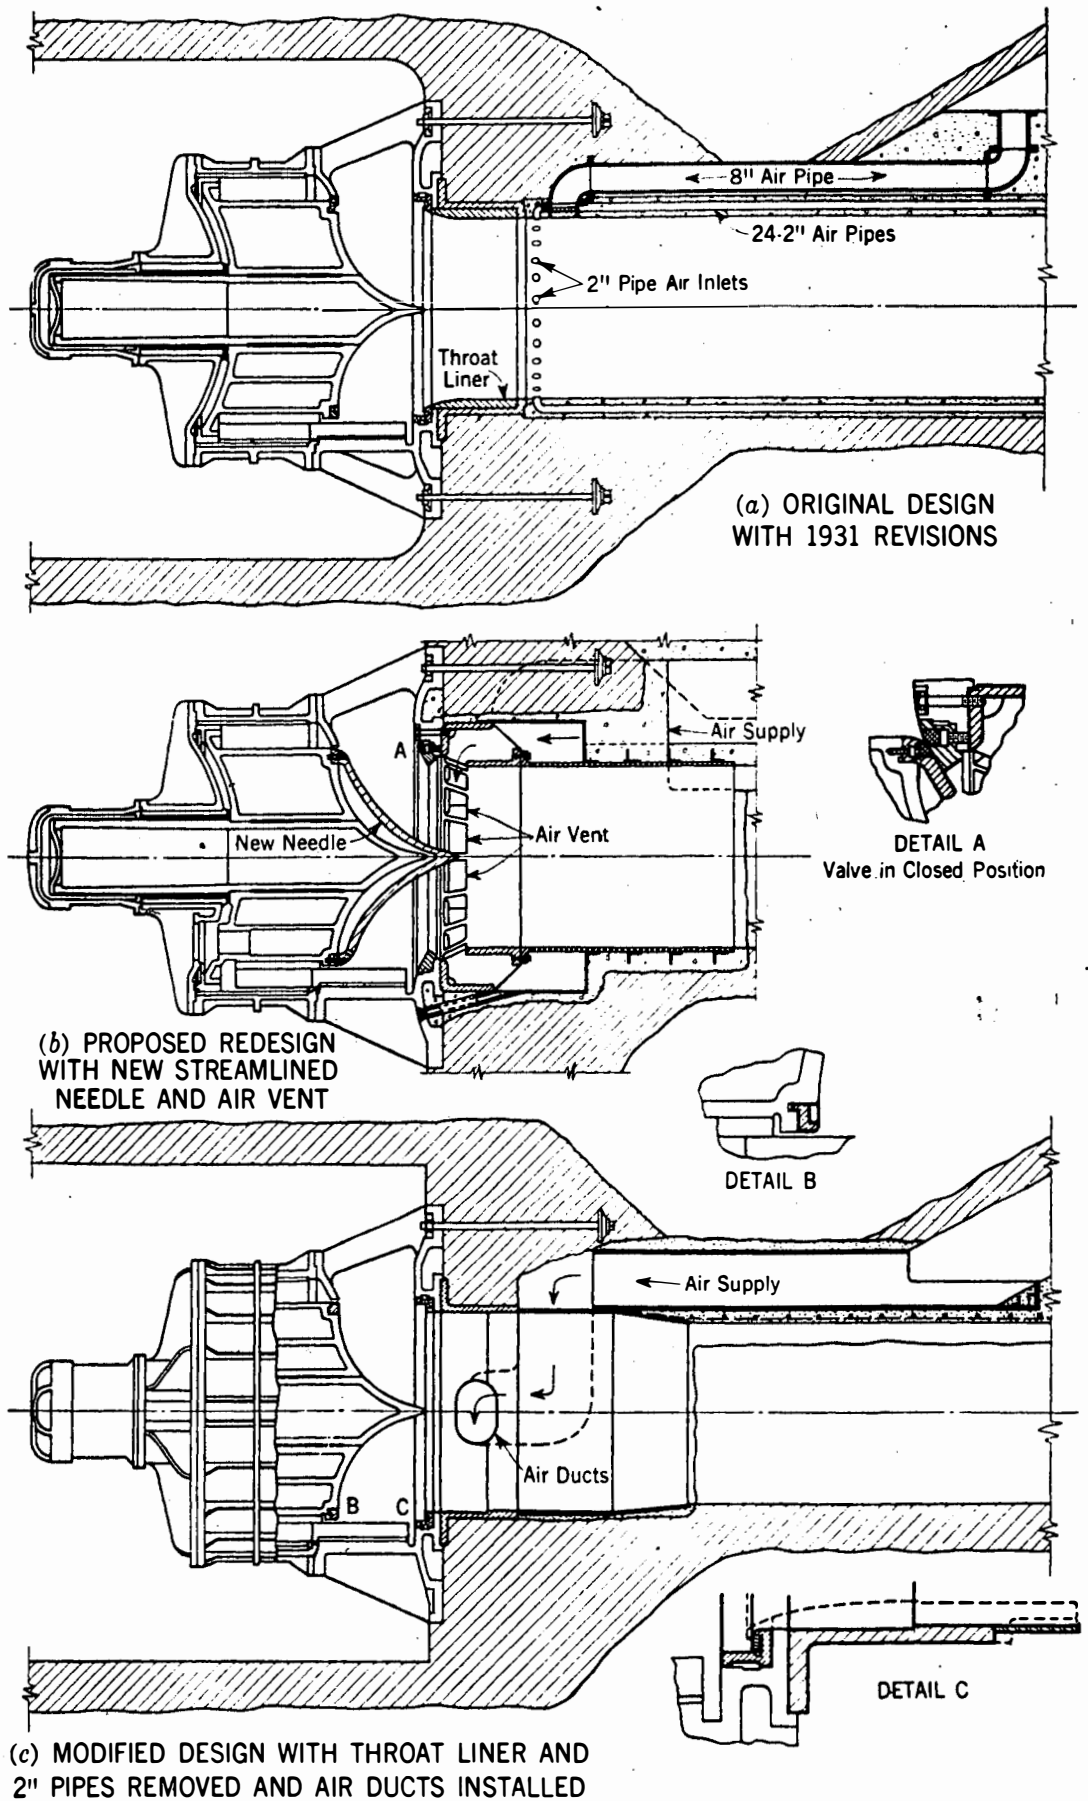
BALANCED VALVES IN THE LOWER OUTLETS AT SHOSHONE DAM
